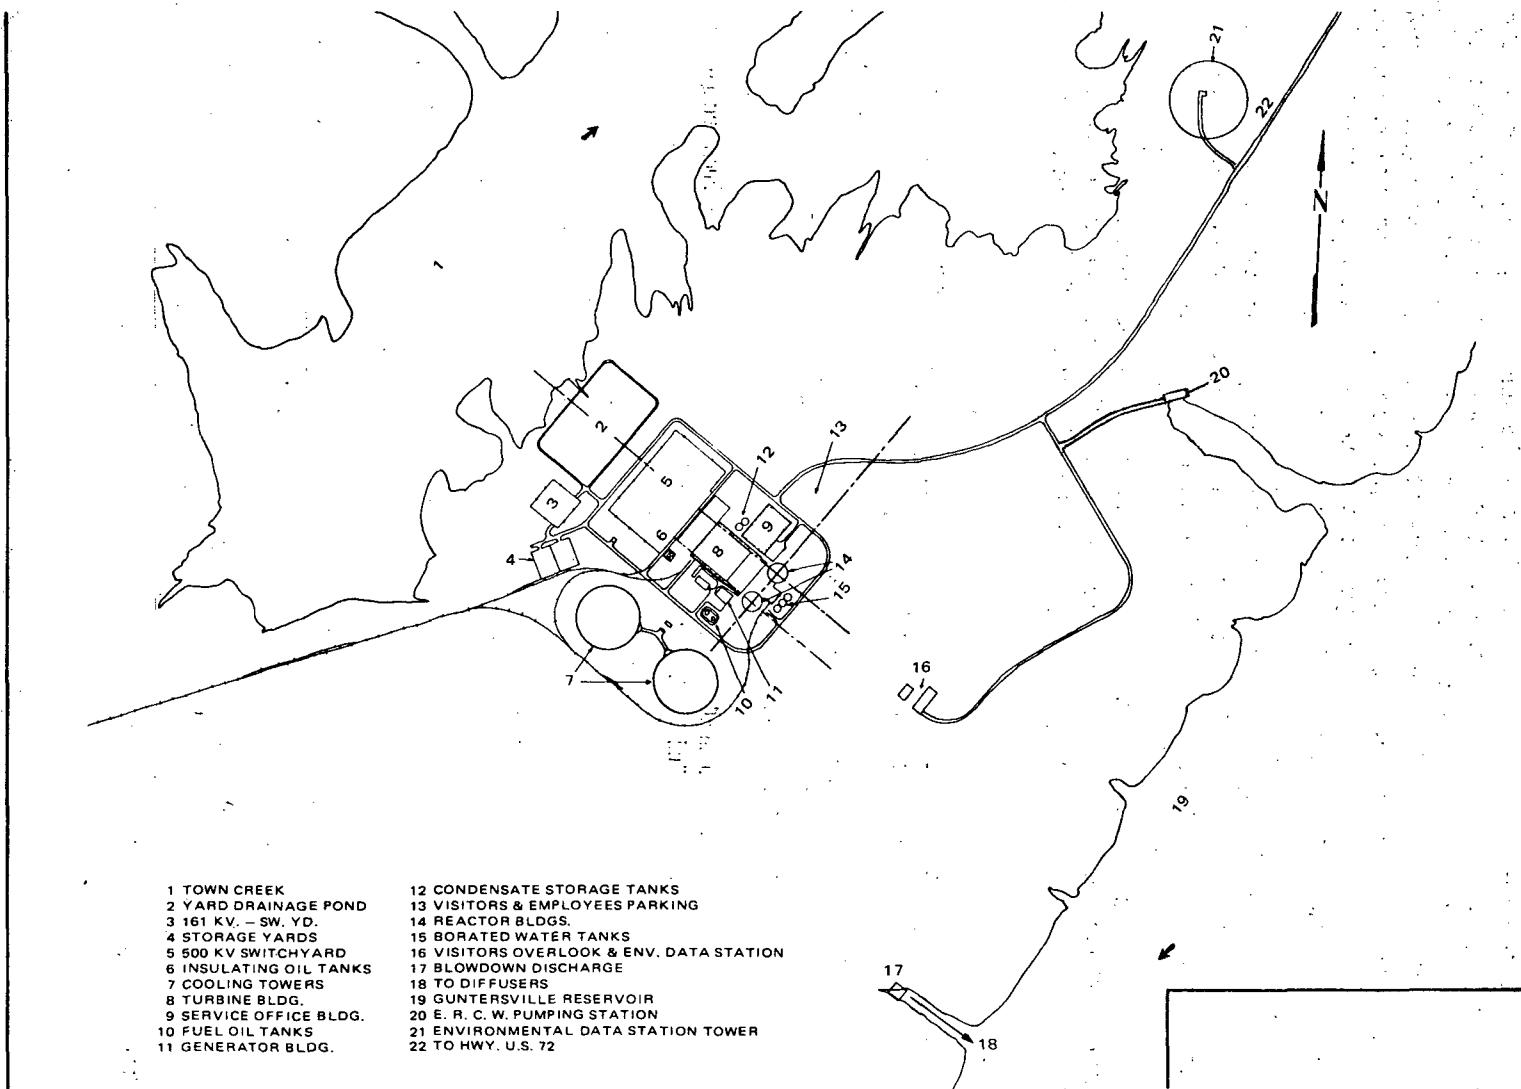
Preliminary Layout of Bellefonte Plant. From TVA DES.
